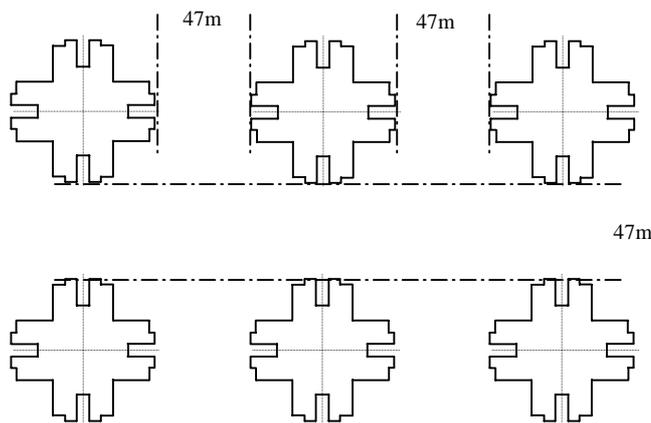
Typical high rise private housing block plan in Hong Kong.
